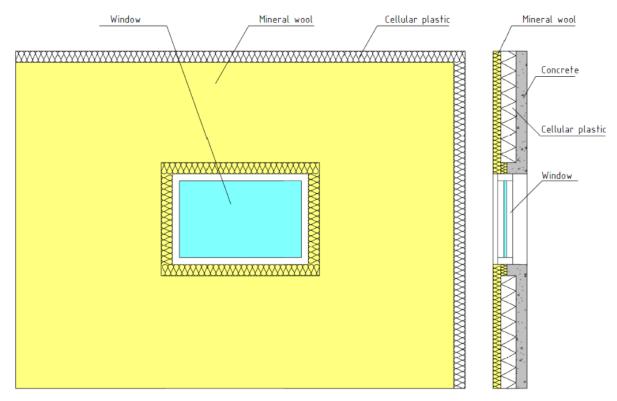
Typical design of half sandwich walls with plaster bearers in mineral wool and safety barriers in connection with windows and element joints.
